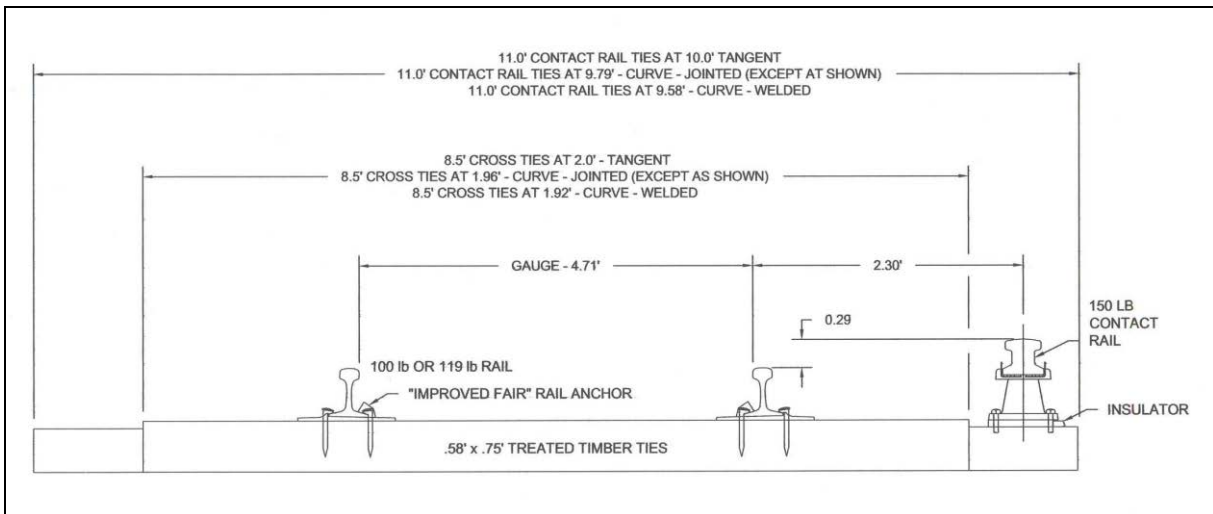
Typical TTT Cross Section, Track Assembly IV, V and VI
